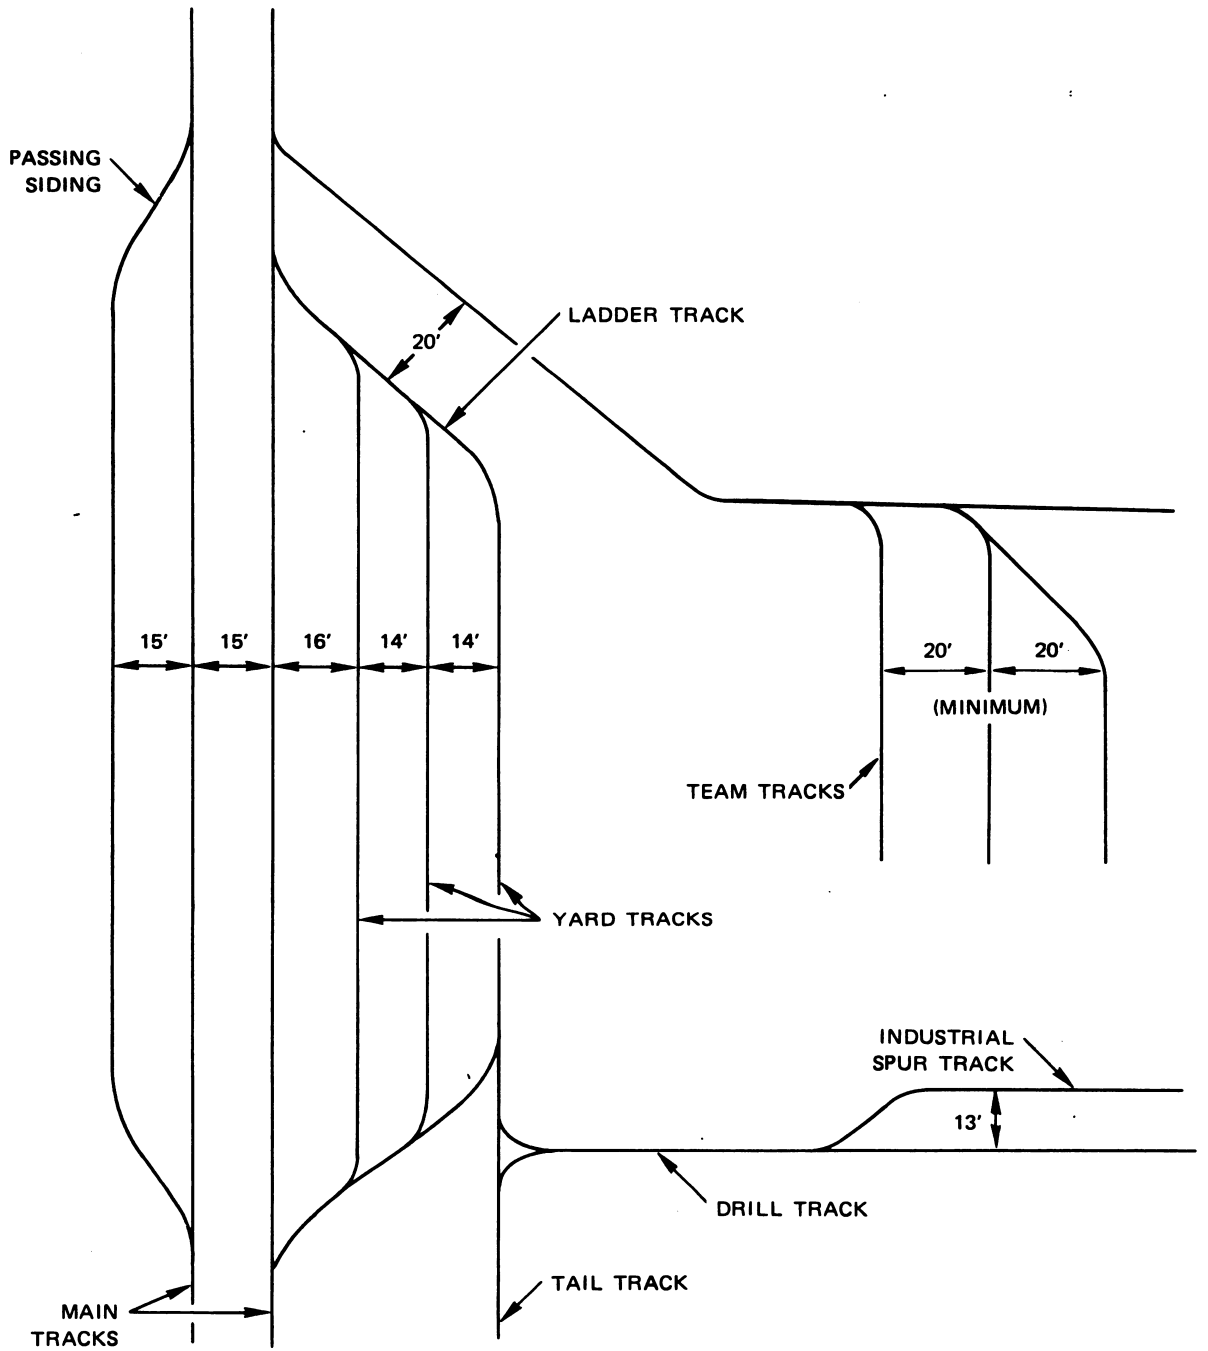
TYPICAL TRACK SPACING REQUIREMENTS
